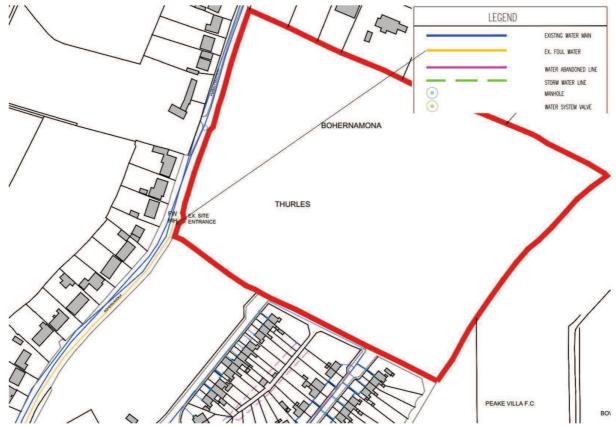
Location of Existing Foul Water Services located at the main entrance to the site at the south west corner
